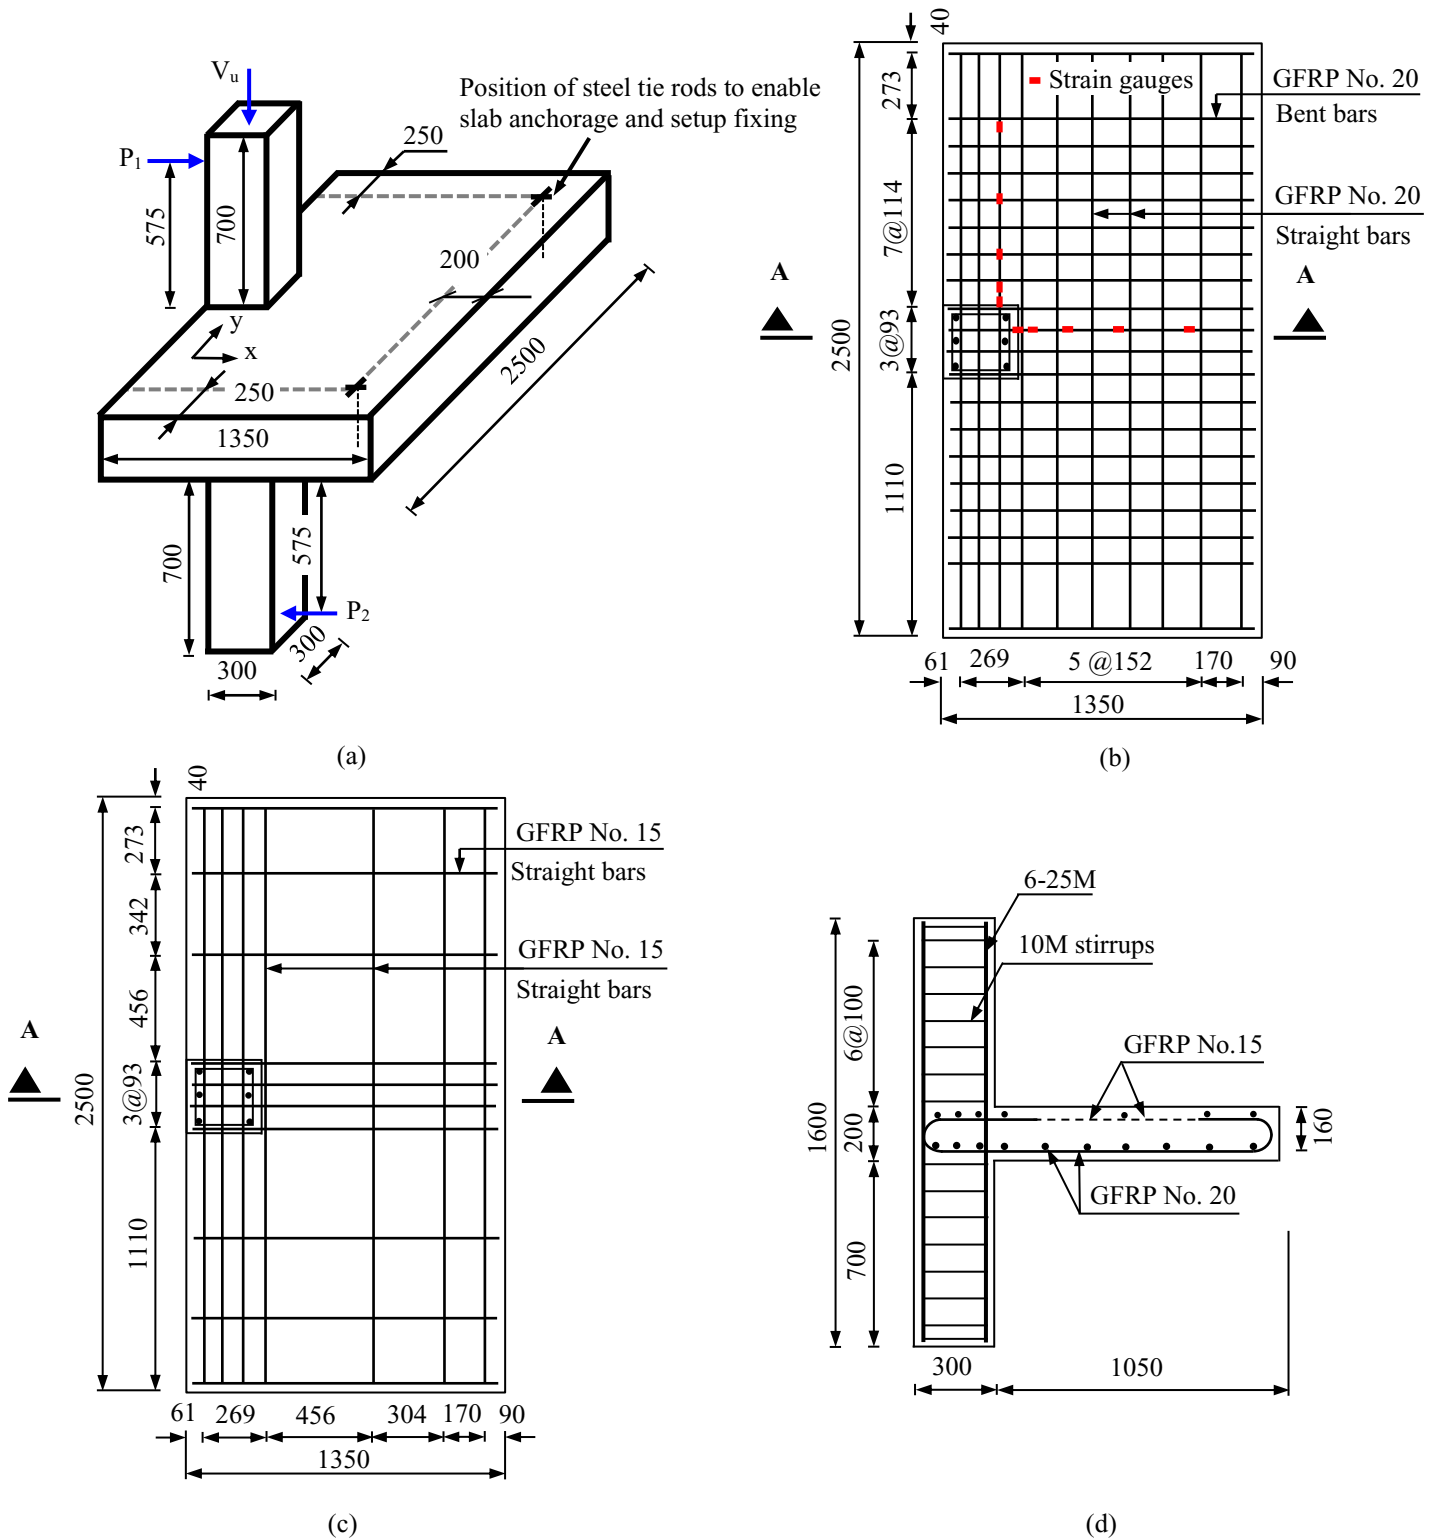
Typical slab geometry and reinforcement details: (a) Concrete dimension; (b) Bottom mesh configuration; (c) Top mesh configuration; (d) Sec (A-A) (Note: 1 mm = 0.0394 in.)
